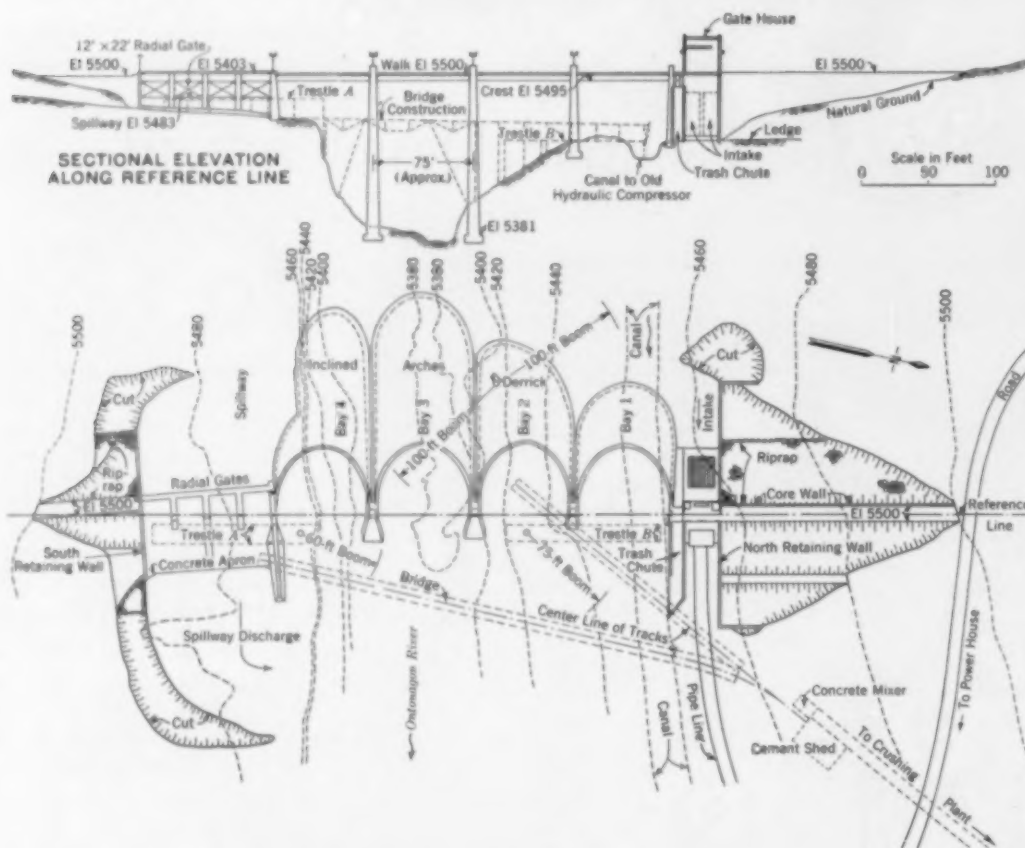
PLAN AND ELEVATION OF VICTORIA DAM
